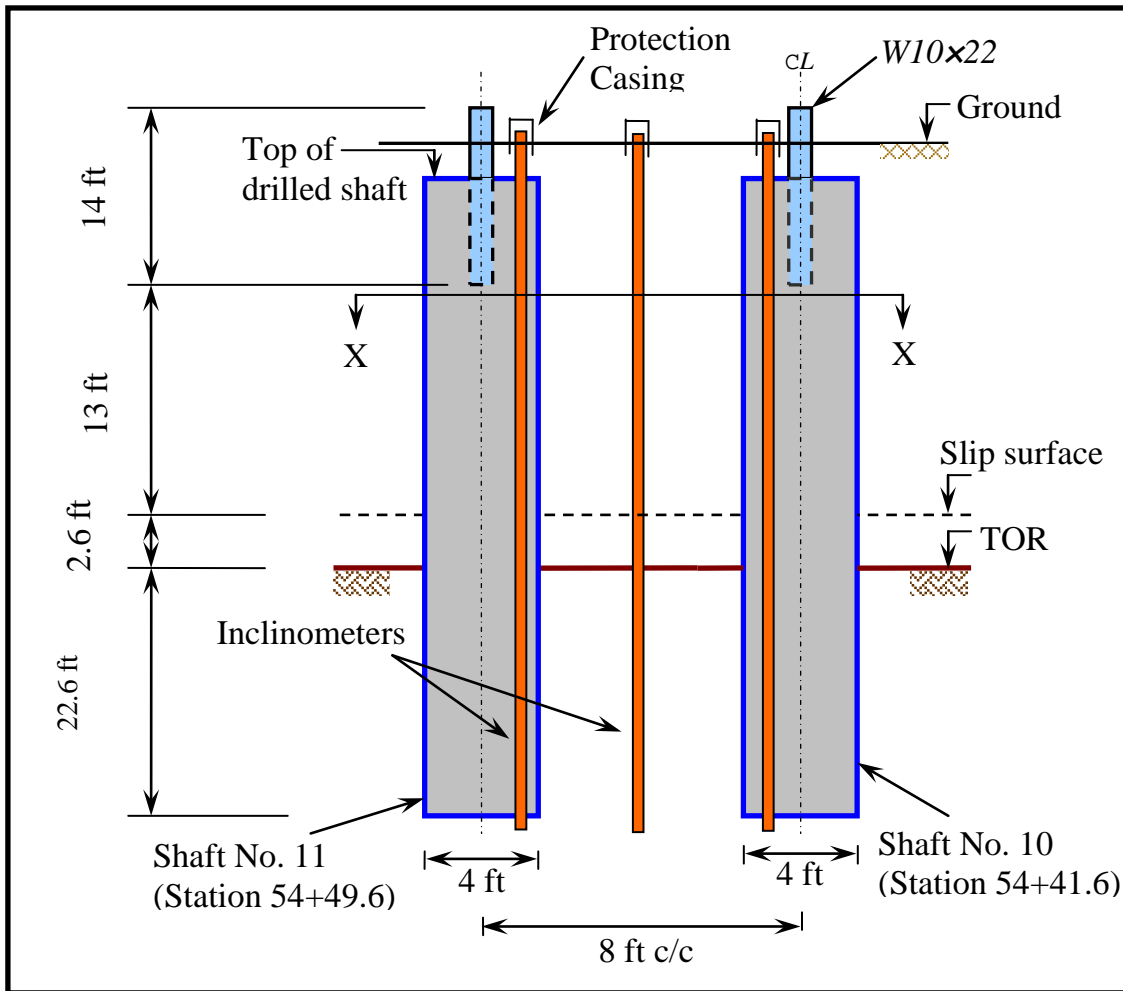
A Schematic Elevation View of Inclinometer Casing Location at the MRG-376 Site
